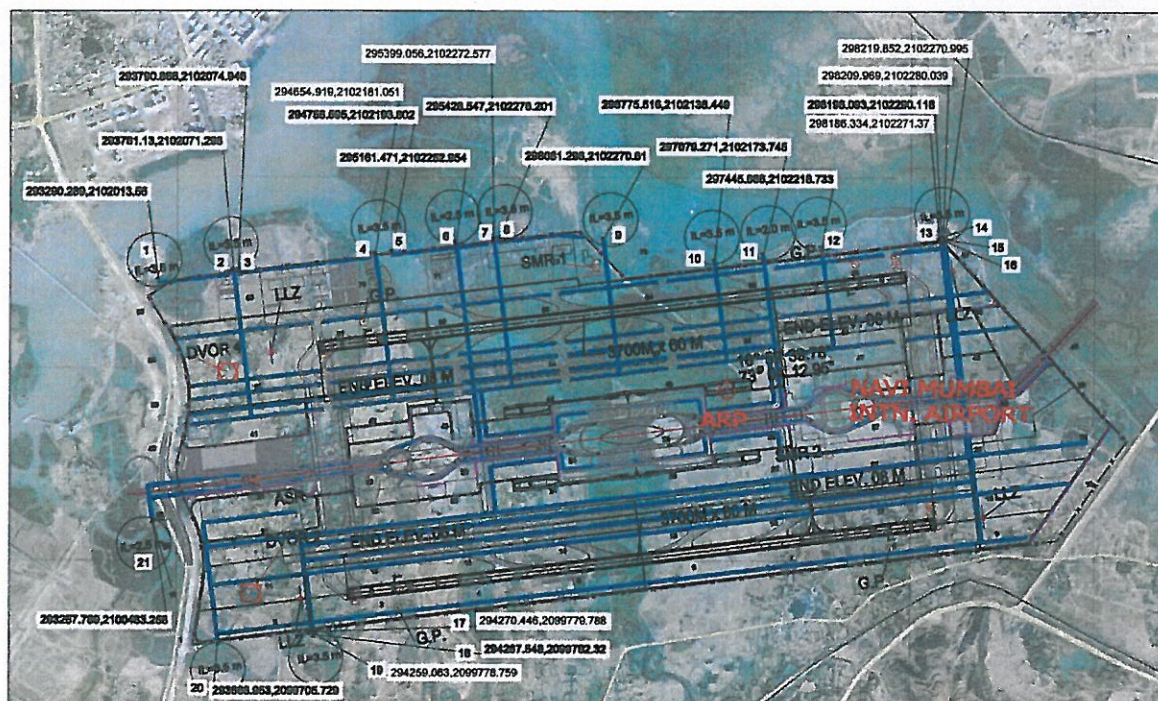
LAYOUT OF AIRPORT SHOWING LOCATIONS OF OUTFALLS FOR STORM WATER DRAINAGE FROM AIRPORT AREA
